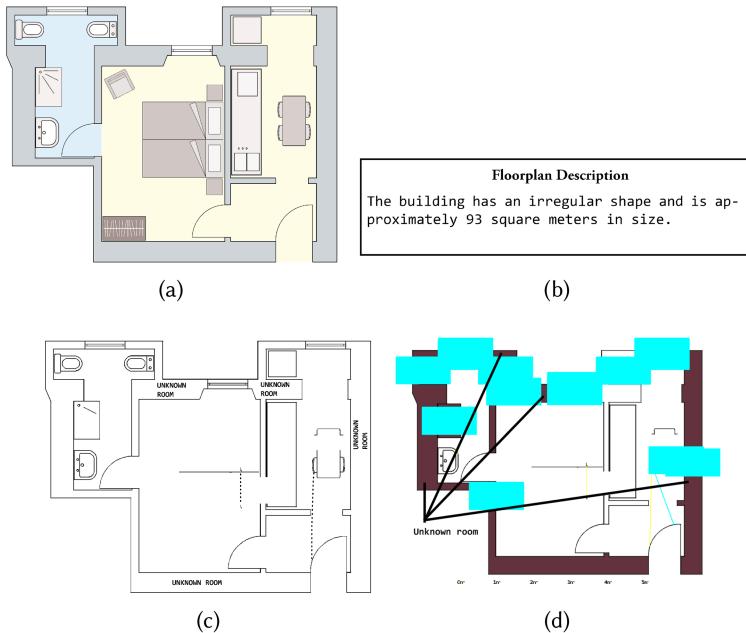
shows a sample from the RSVG dataset for which floor plan component recognition has performed fairly well. Most of the walls and windows are detected accurately. However, some floor plan areas are inaccurately assigned as windows. Some text has been missed, leading to subsequent errors. For instance, because “Bath” has been missed, the toilet and bathroom are recognized as one room “toilet.” This means that the system does not realize that it should look for a door to
